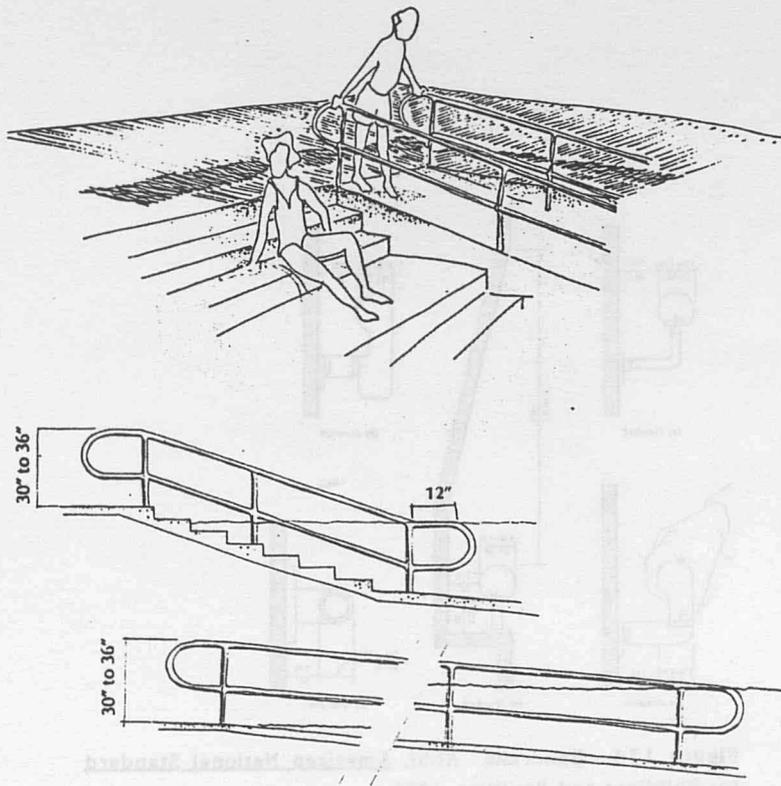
U.S. Department of the Interior, A Guide To Designing Accessible Outdoor Recreation Facilities, January 1980.
